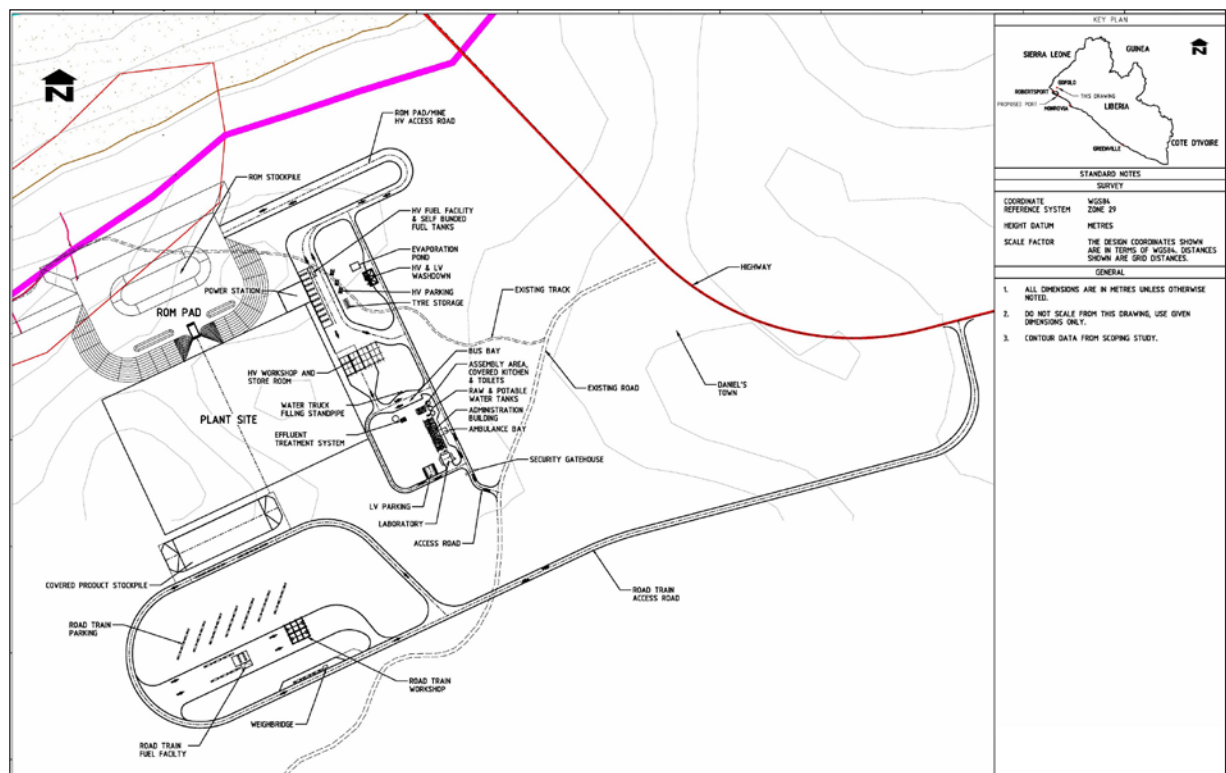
| ROM, Plant and utilities/office layout drawing for first mine site
